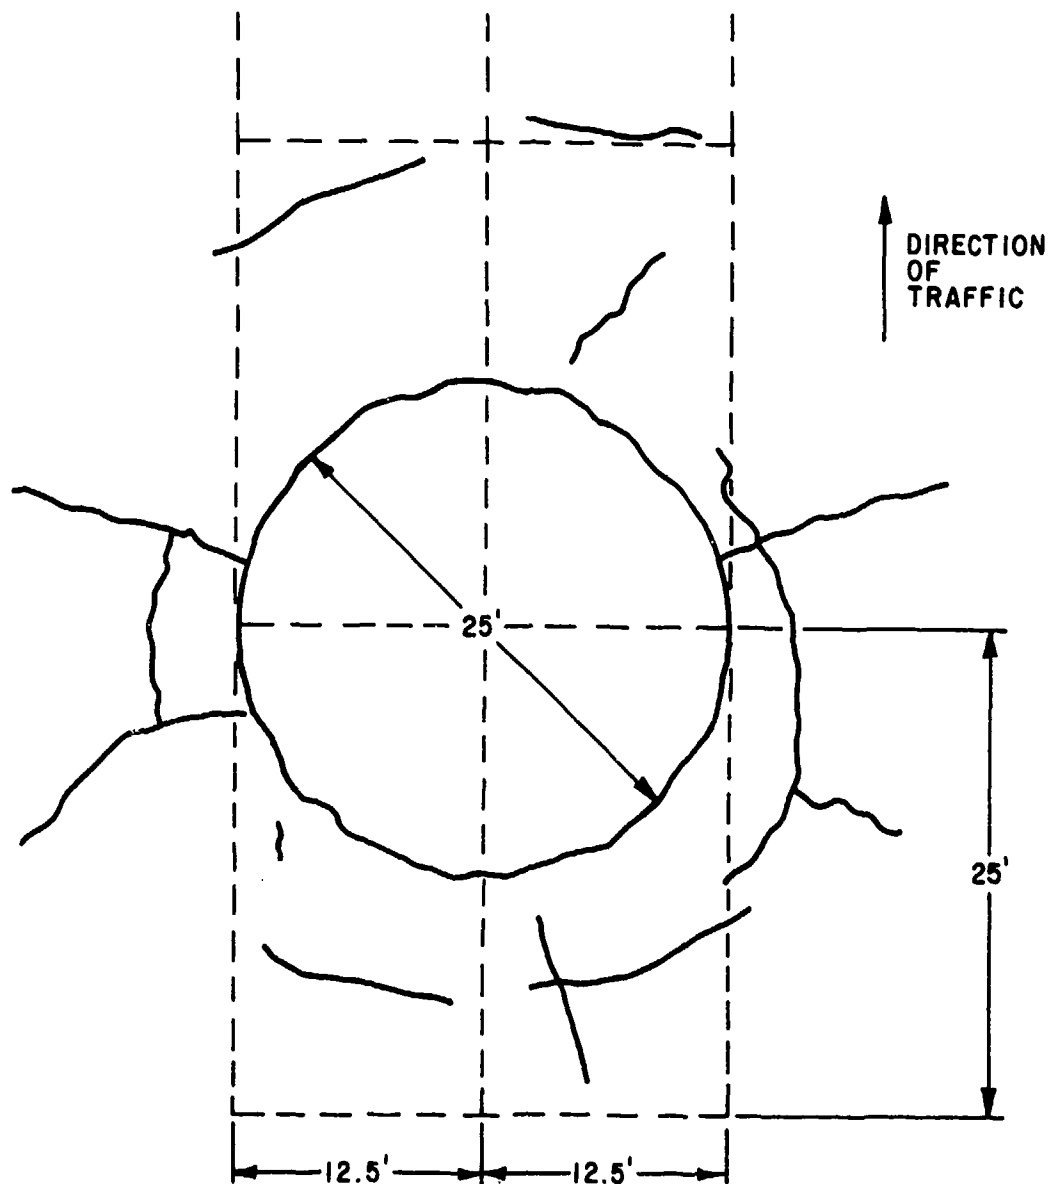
Cracking Pattern in Runway Slabs Surrounding Crater 2
